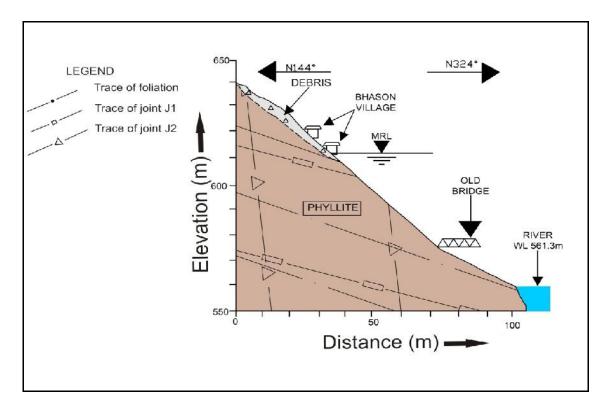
Geological Section of Slope LBS5 8.5 km d/s of Zero Bridge (near Bhashon Village just above Old Girder Bridge)
